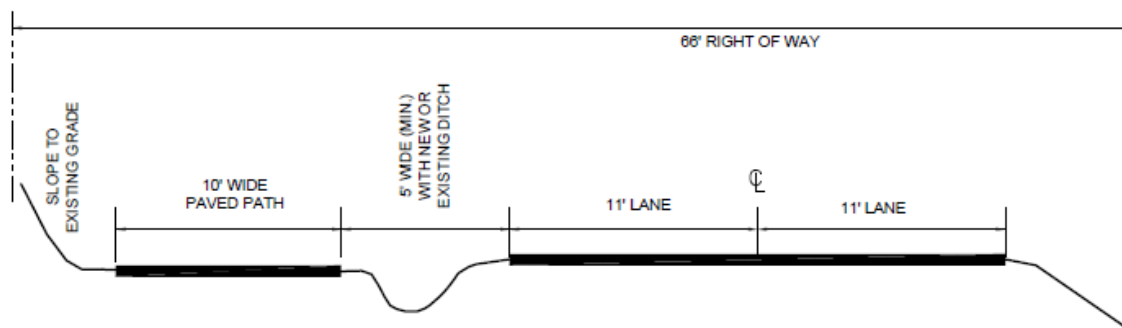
Typical Cross Section of the Path Adjacent to the West Side of the Road
